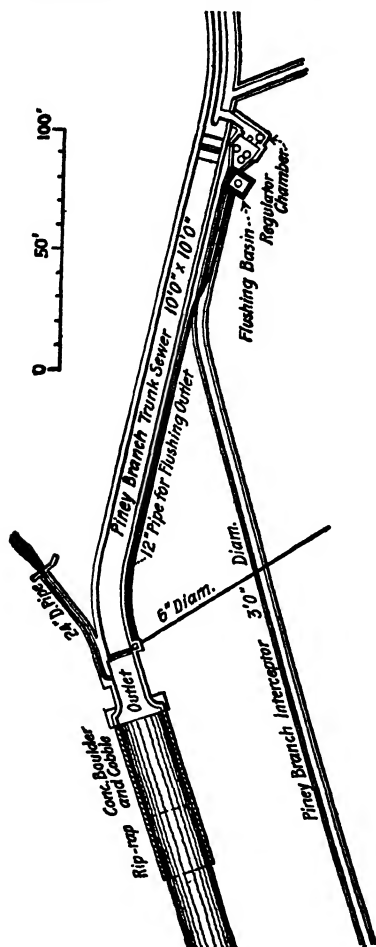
Plan of regulating works, Piney creek sewer, Washington, D. C.
